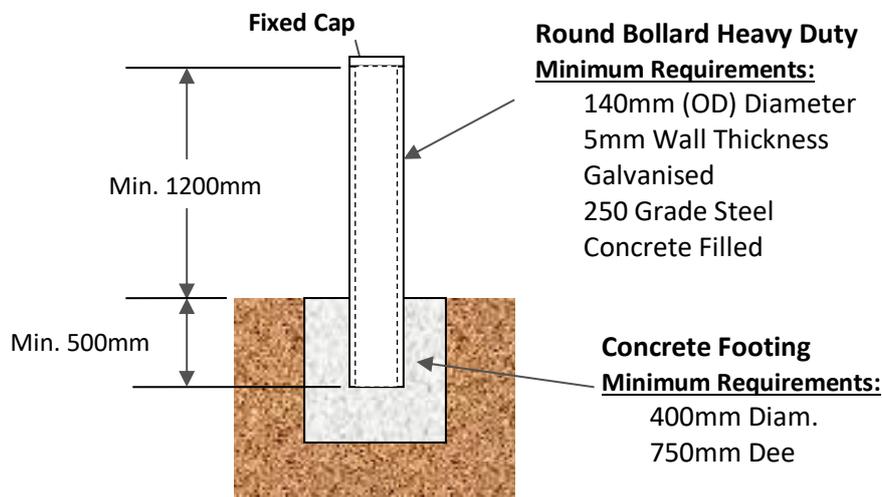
Typical Fixed Round Bollard Heavy Duty - (Not to Scale)
